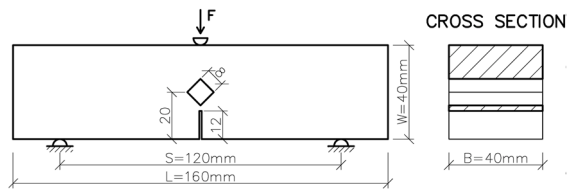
Specimen geometry and the three-point bending fracture test configuration [28].
